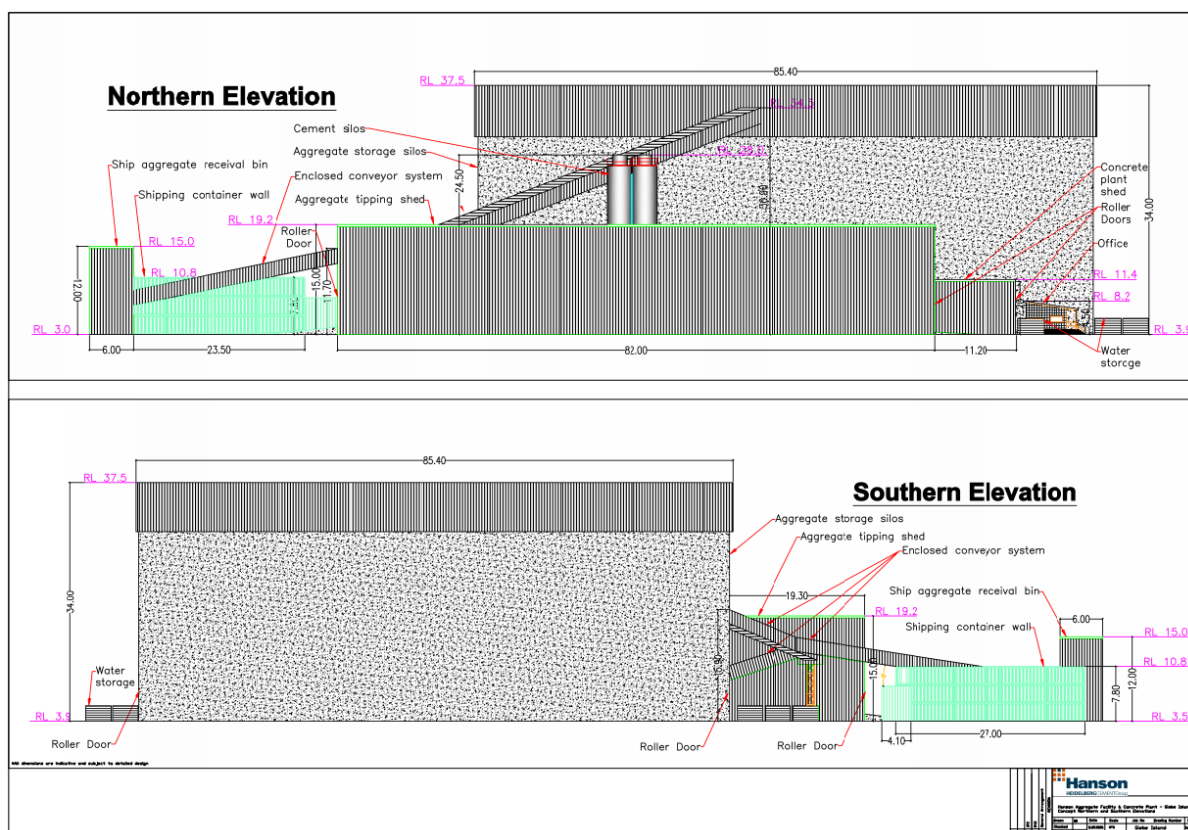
Northern & Southern Elevations (Source: Applicant's Information 24 May 2021)
